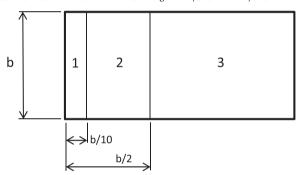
Proposed recommendation for loads on the MWFRS with wind parallel to eaves. Key to roof zones.
